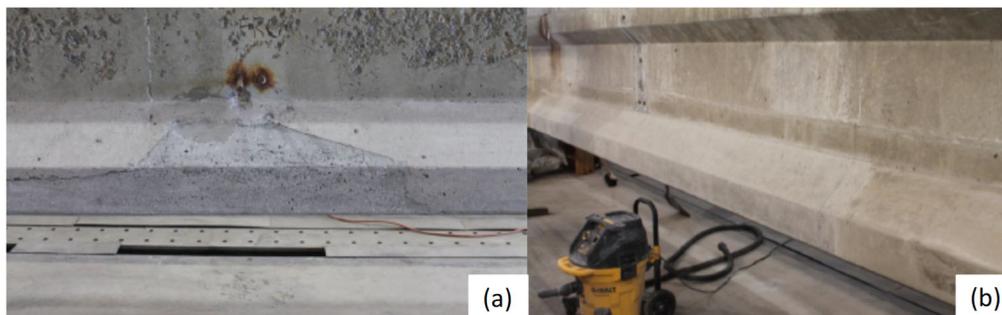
Repair location of an impact damaged bridge (a) after formwork removal and (b) final surface preparation [20]
